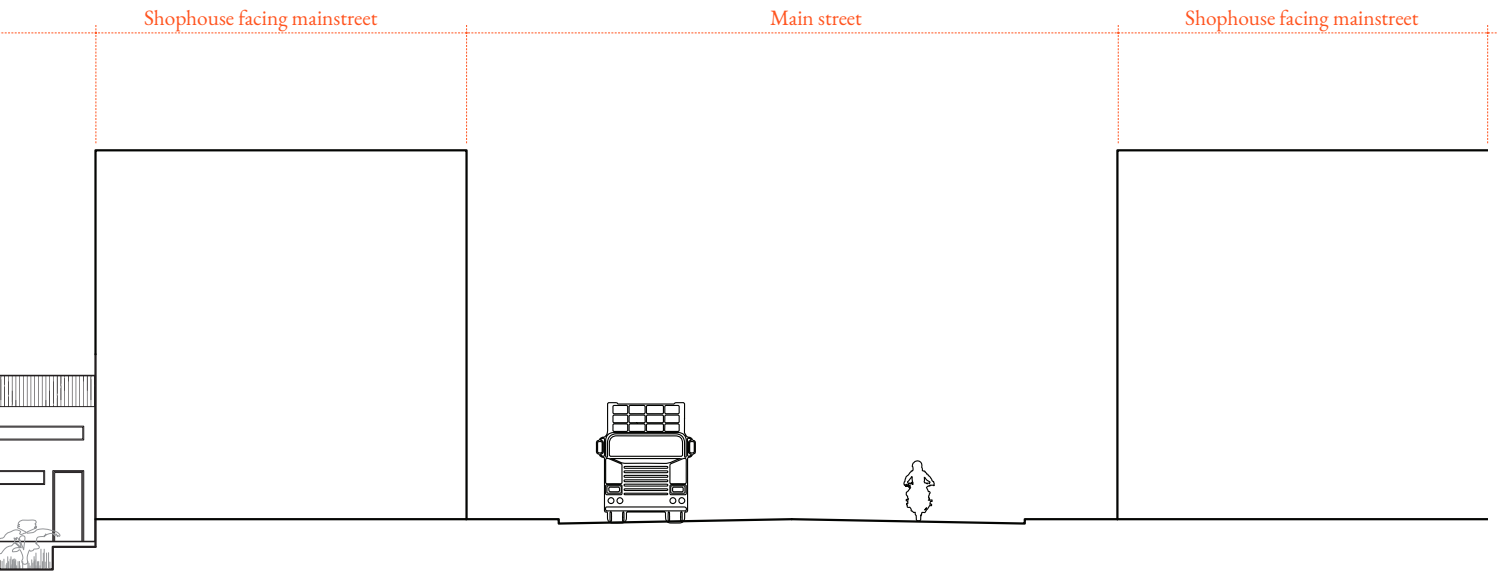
Section/Elevation drawing with adaptive ground flood in normal condition.
